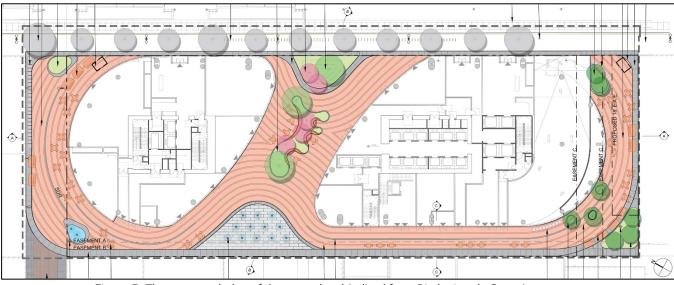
The proposed plan of the street level (edited from Bjarke Ingels Group).
